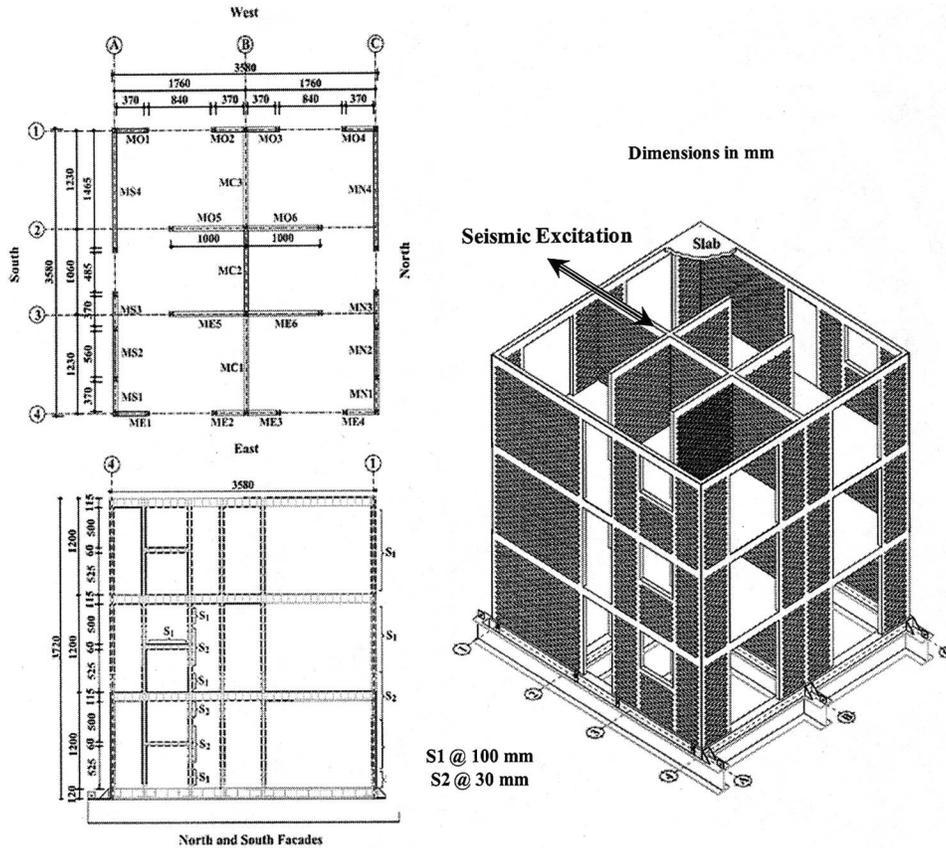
Structural layout of 1:2 scale model of sample confined masonry building (Barragan and Alcocer 2006).
